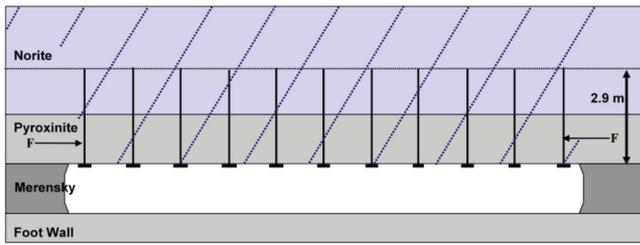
3 m cable anchors with 60° joints in a 20 m panel
